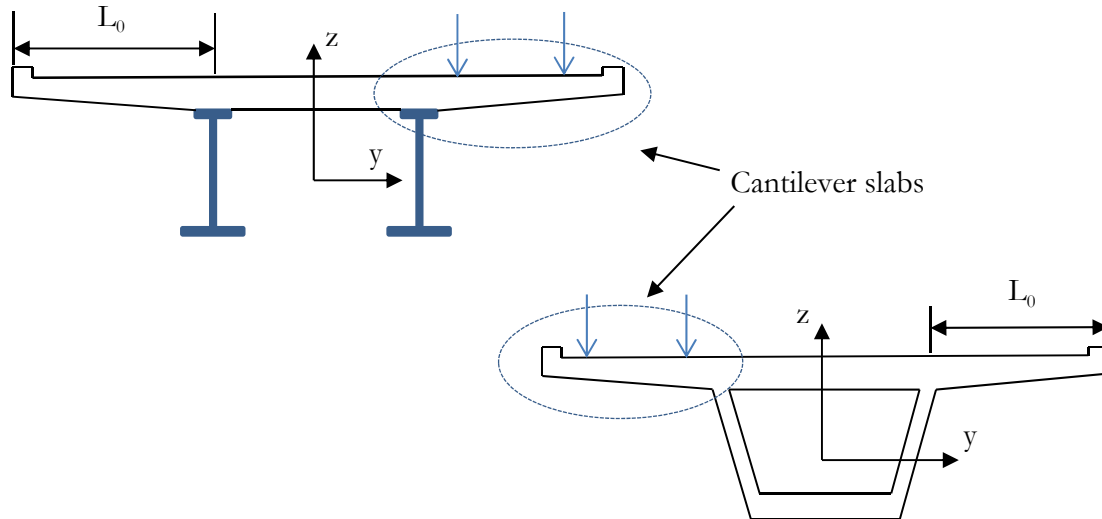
Cantilever slab – load transfer in transversal direction.
